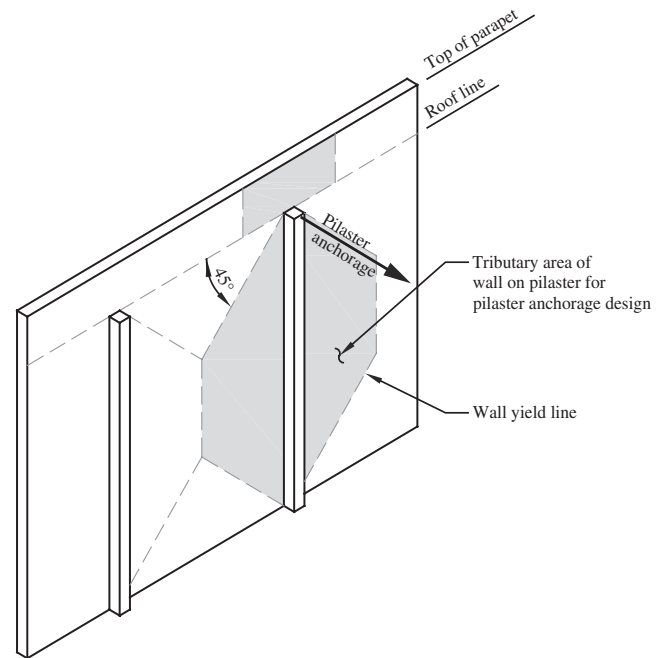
Tributary Area Used to Determine Anchorage Force at Pilaster
